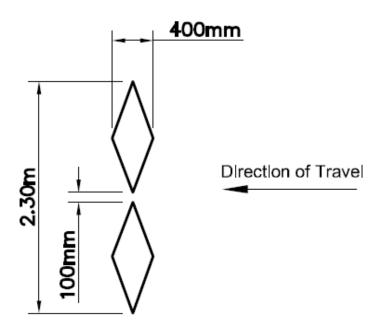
ZELT loop layout for Riccarton Road, Dyers Pass Road and Sparks Road
